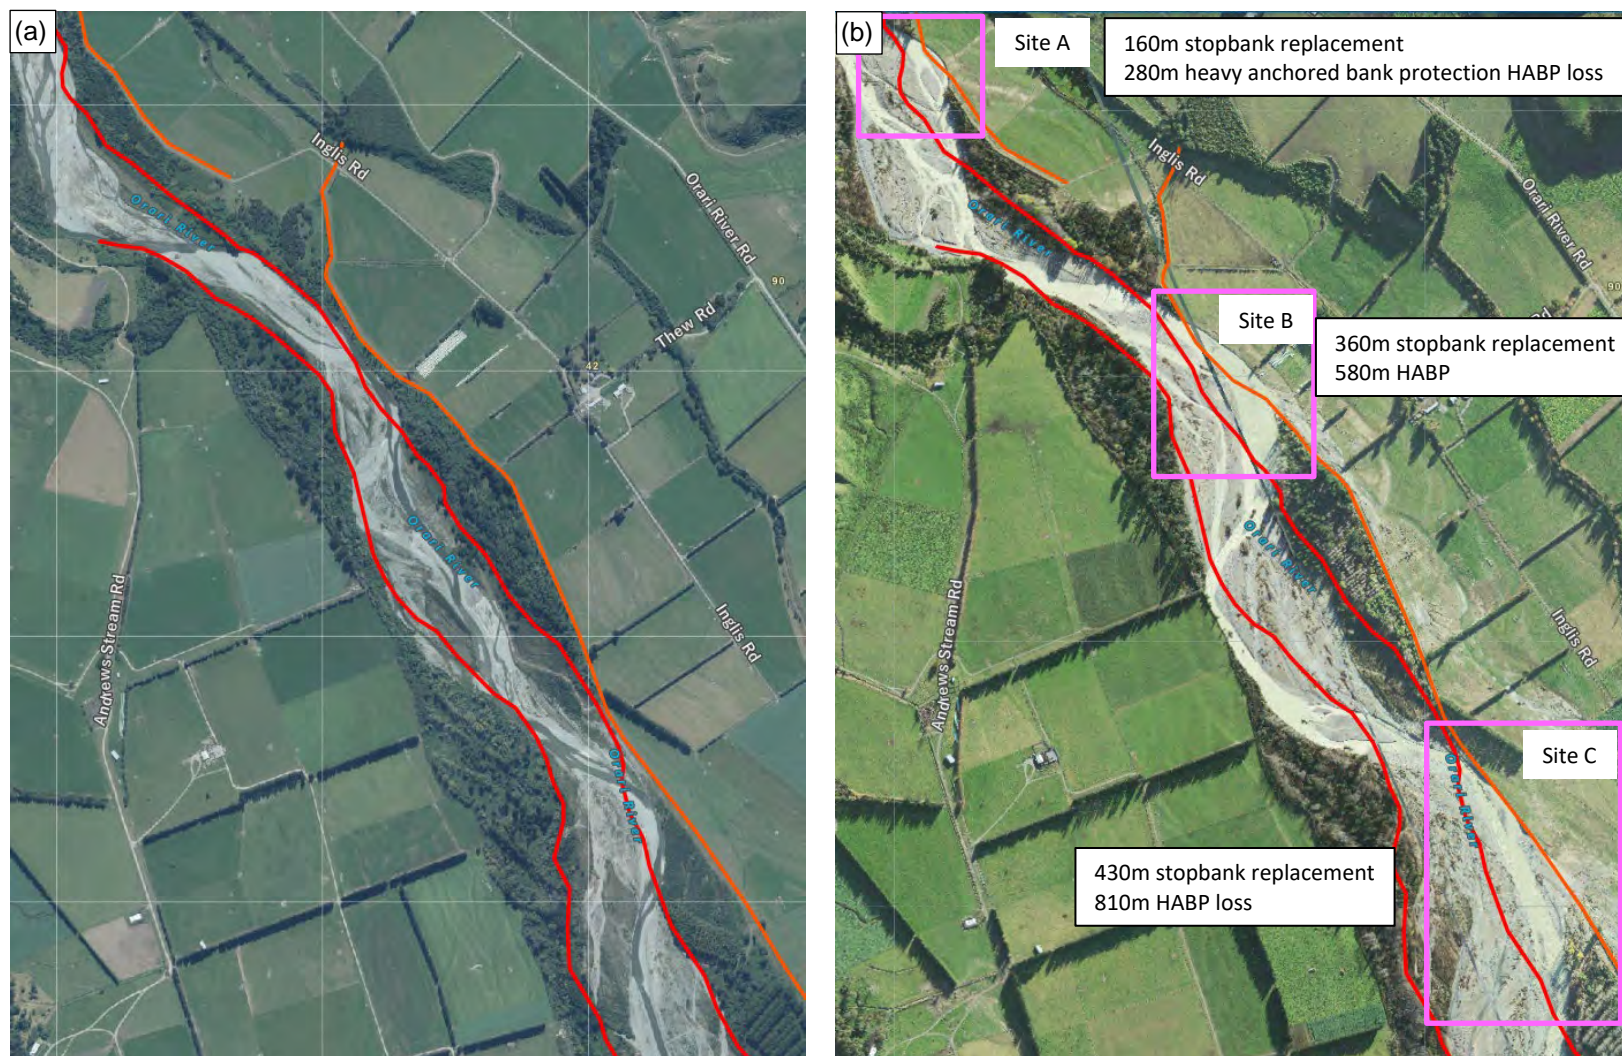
Orari at Inglis Road north of Geraldine: (a) Aerial view prior to flood, (b) post-flood aerial showing extent of stopbank and tree edge protection asset loss at three sites.
